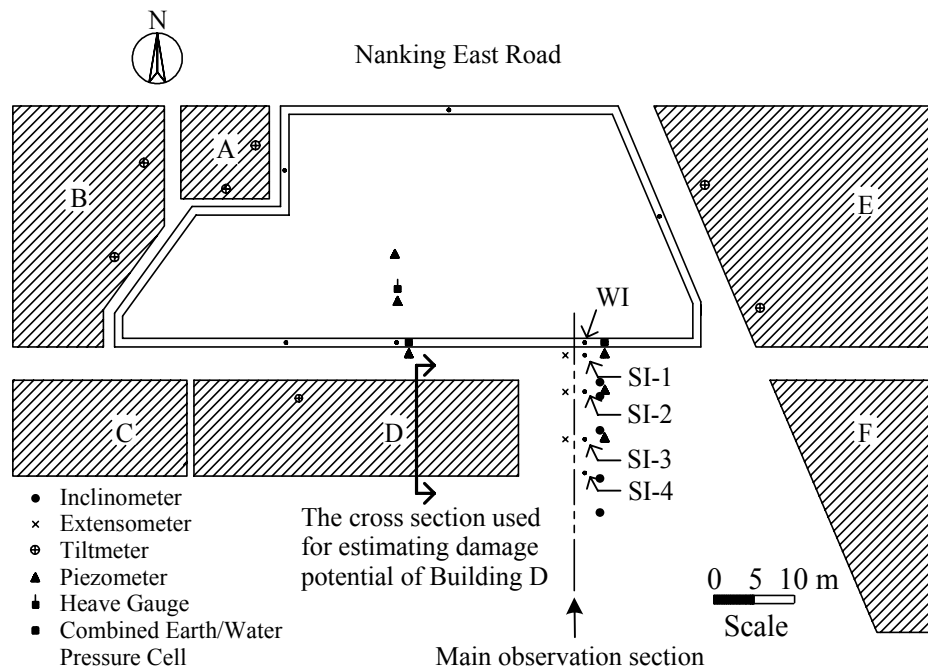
Plan view of the TNEC case and the instrumentation plan (Adapted from Ou et al. 1998)
